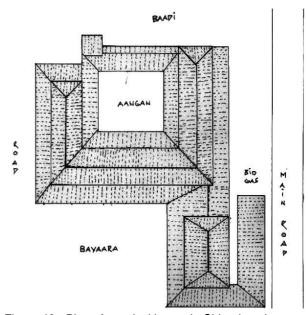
Plan of a typical house in Chhattisgarh Source: Archinomy
